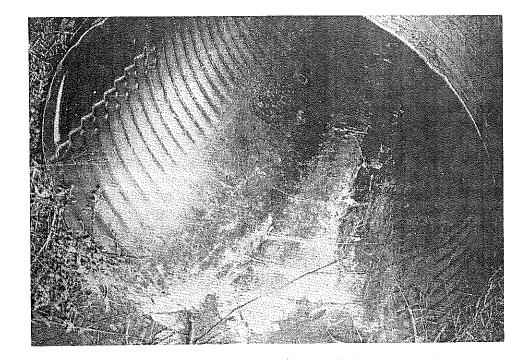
Inlet of a 24-in. diameter coated and paved culvert completely shaded by overhanging rock. No scaling was evident, and only minor cracking had occurred for a distance of 3 to 5 in. These conditions were typical of all coated and paved pipe which were shaded and placed on sufficient slopes to prevent ponding of water at the inlet and outlet.
